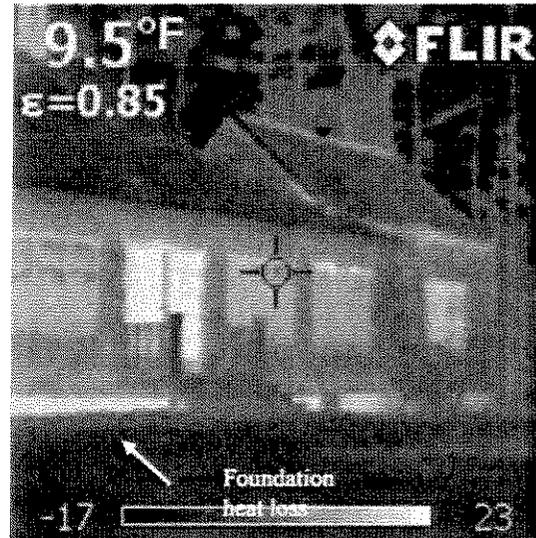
Grant House- Back: Heat leaks from foundation. Note that roofs are darker than
